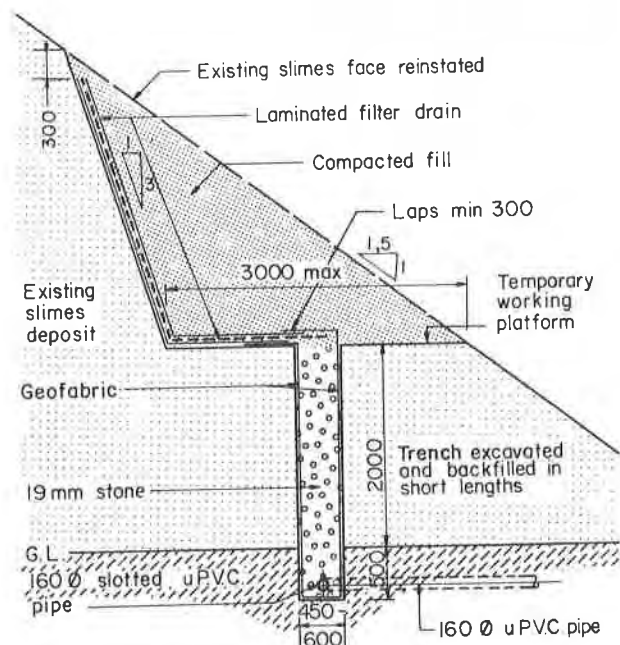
Crown Sand Slimes Disposal - Toe drain detail
